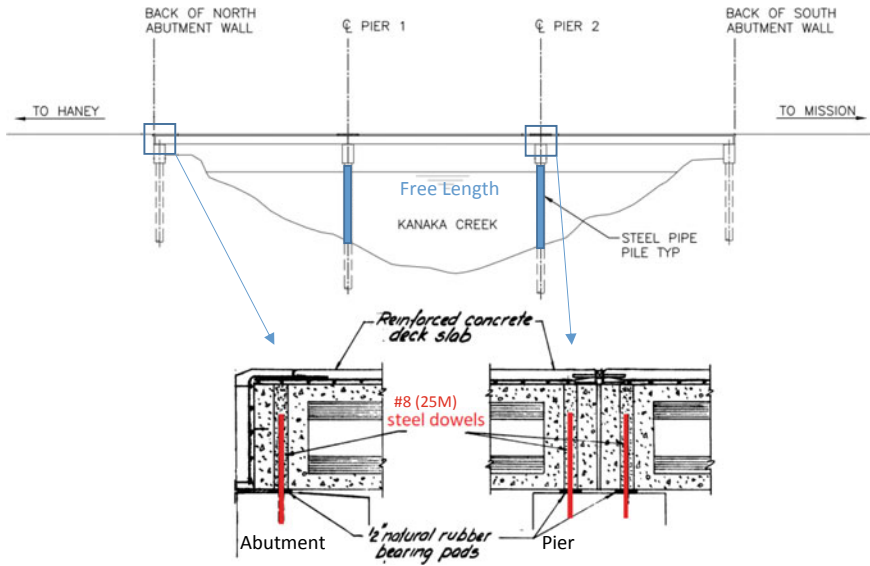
Bridge elevation view (top) and dowels connecting girders to abutments and piers (bottom)
